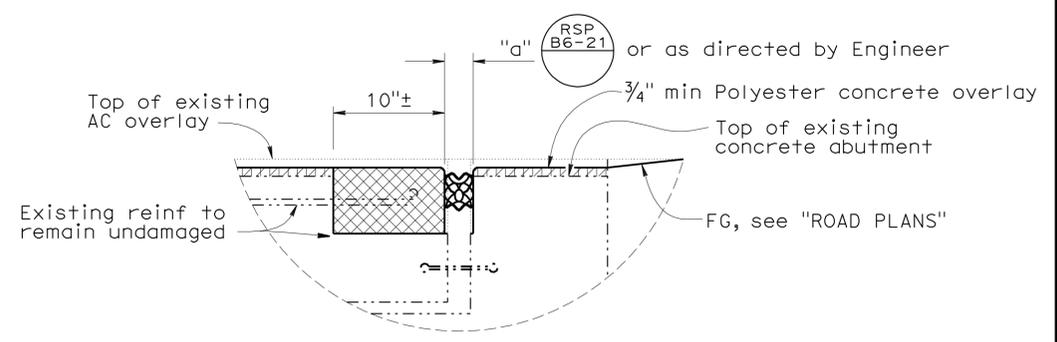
DETAIL C REMOVAL DETAIL (PIER 28N & ABUT 30)
